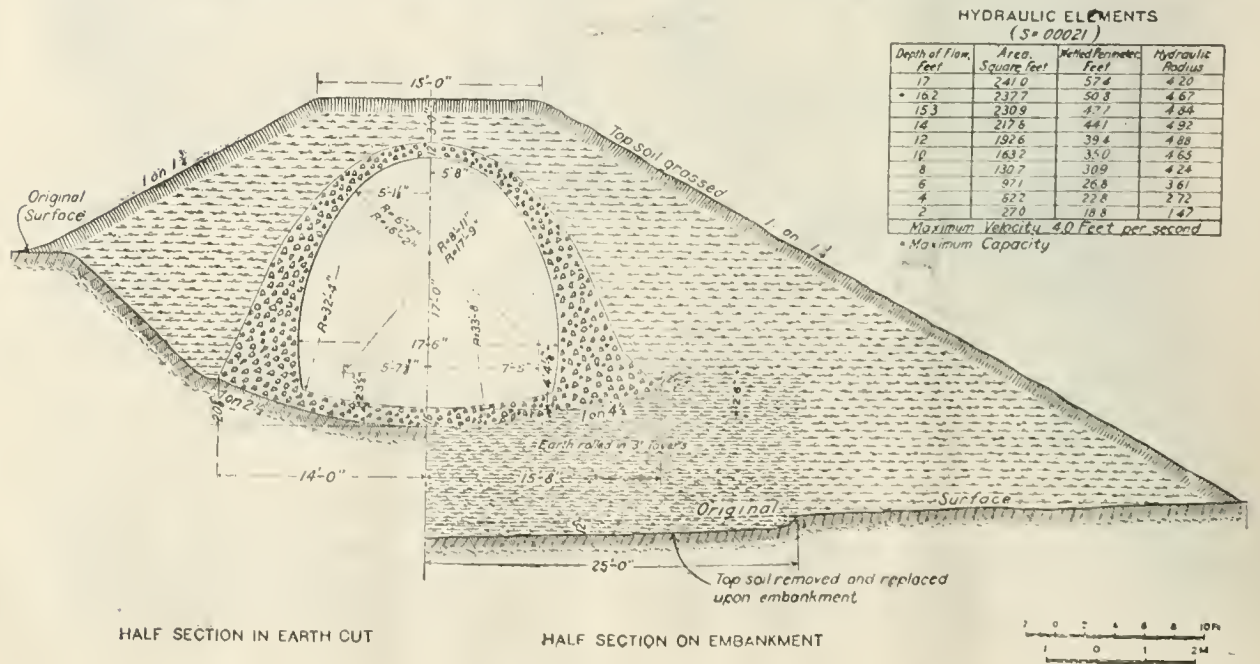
TYPICAL CUT-AND-COVER CONSTRUCTION IN EARTH TRENCH AND ON EMBANKMENT.
